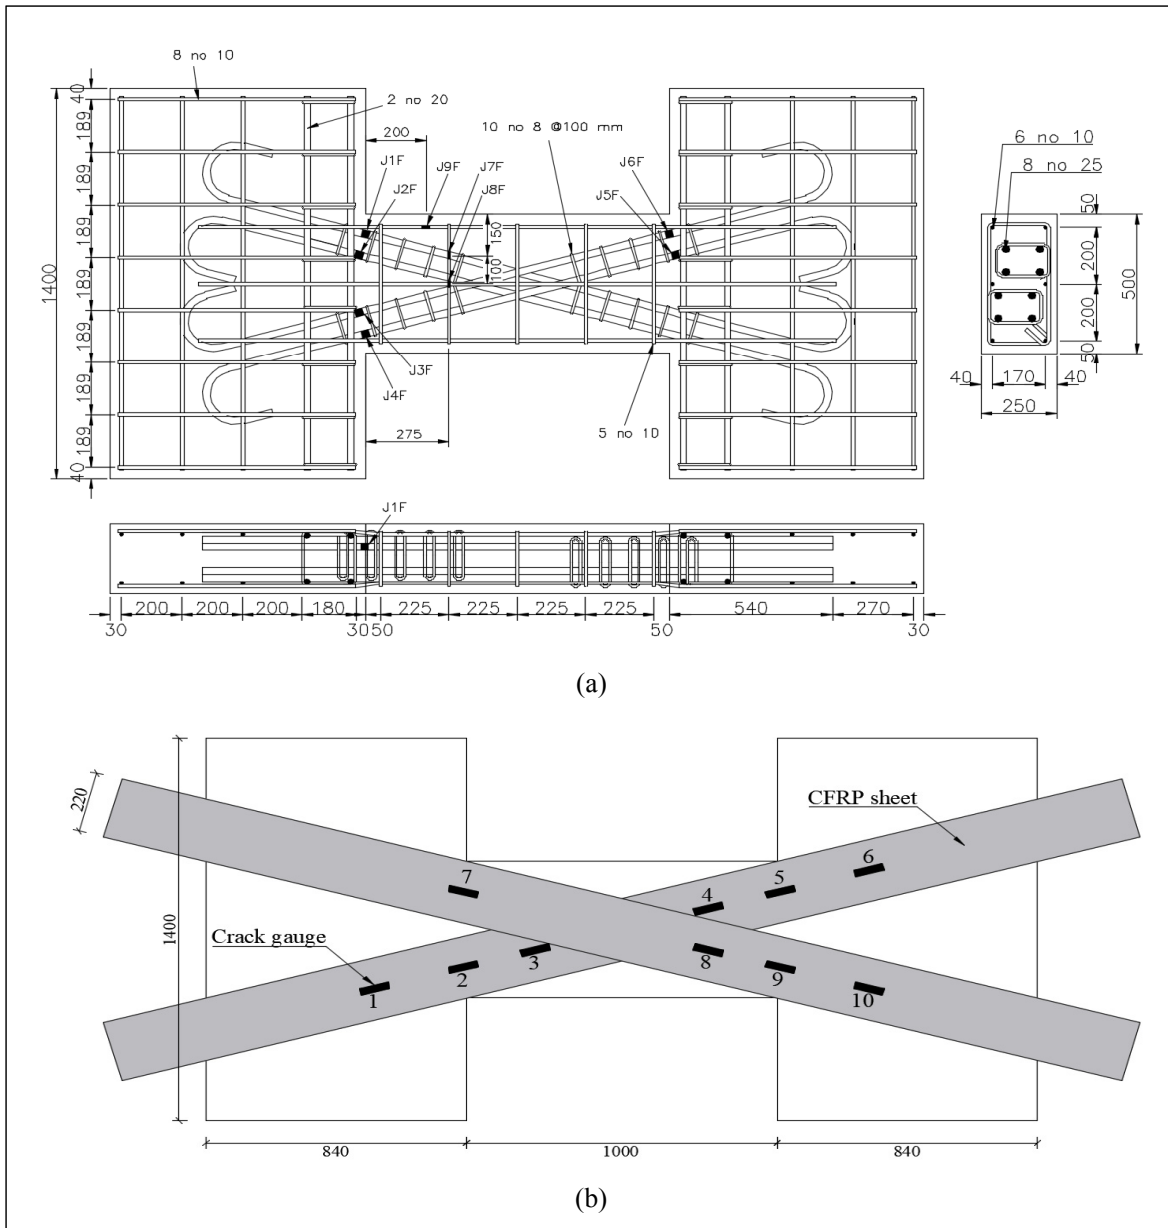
Geometry, reinforcement details, CFRP configuration, and instrumentation: (a) original CB specimen, (b) rehabilitated specimen using CFRP strips, (dimensions in mm)
